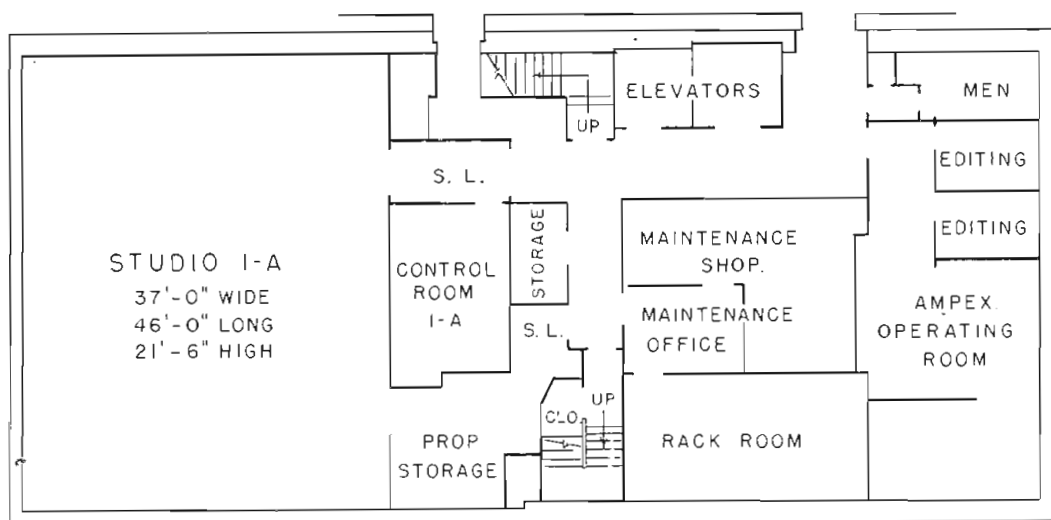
Basement floor plan of American Broadcasting Co. building in New York City
